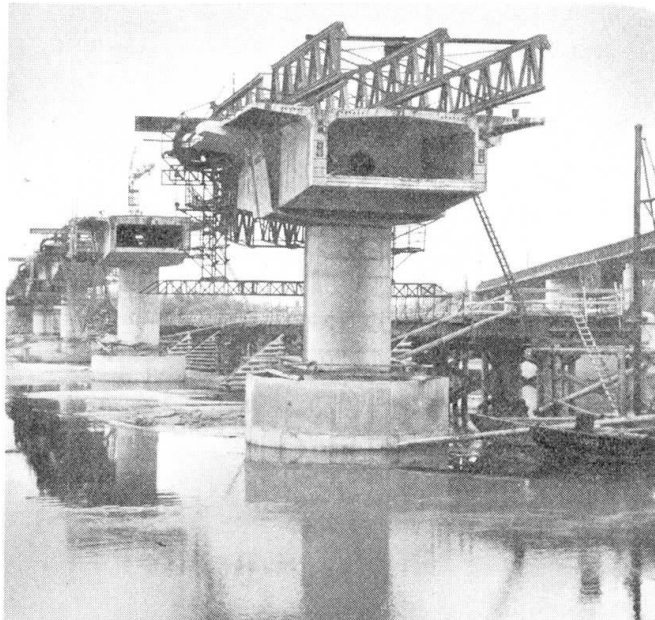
The monolytical concreted cantilever prestressed bridge "KO".
